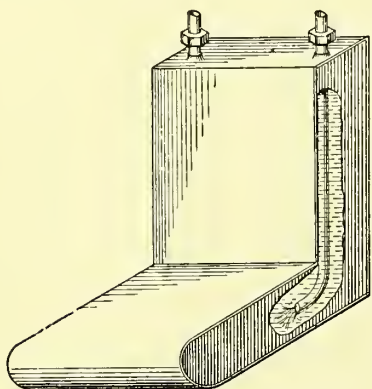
Method of Connecting Return Pipe to Boot Boiler
